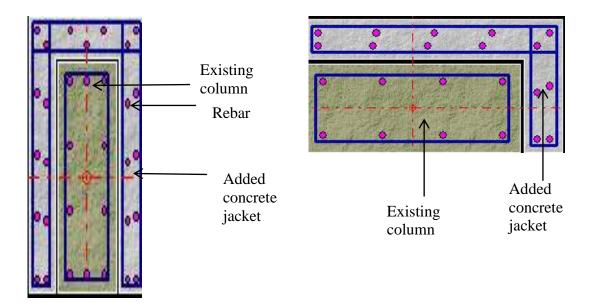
(a) U shape concrete jacket (b) L shape concrete jacket
